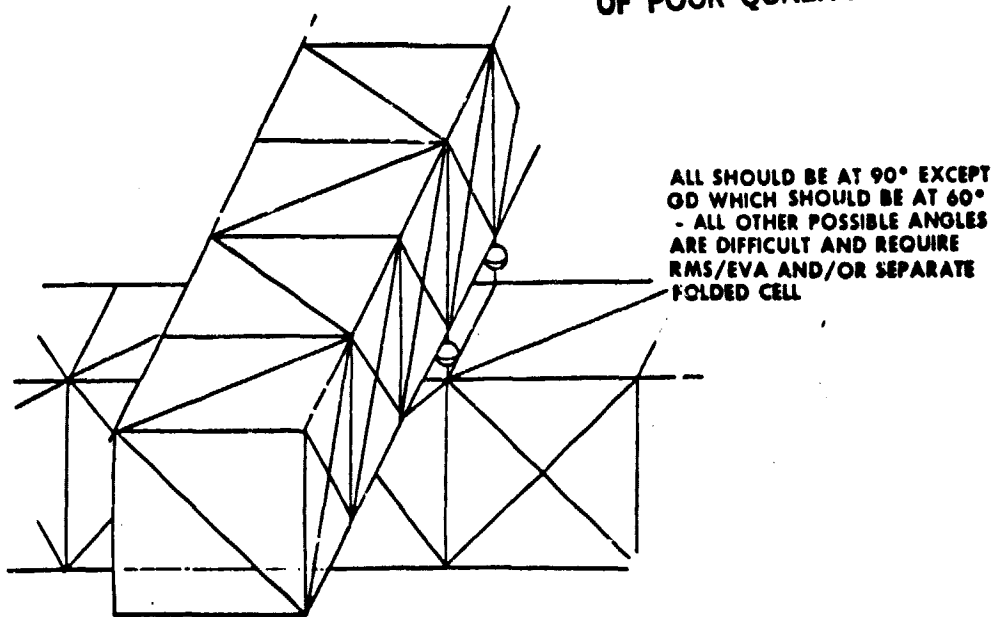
TRUSS-TO-TRUSS LAP JOINT INTERFACE
